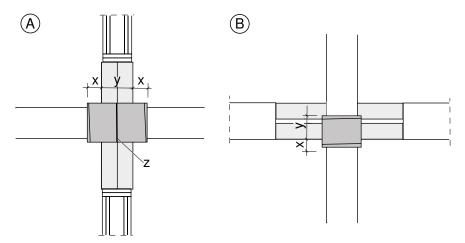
Fire protection bandage to combustible pipes in wall (A) and ceiling (B)
